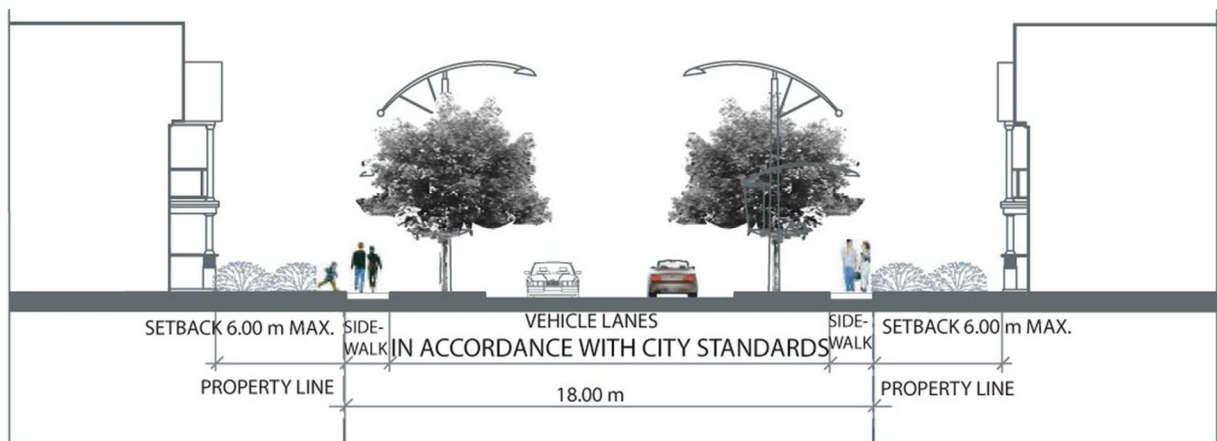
Riverside South CDP Cross-Section for 18m Road Allowances
